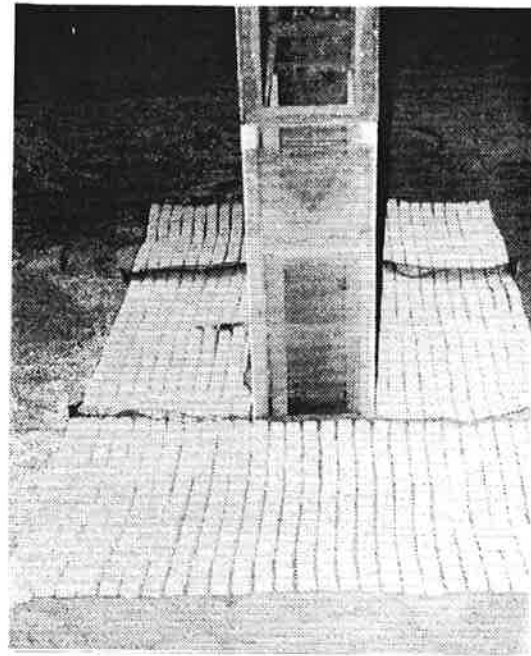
Schematic placement of cable-tied blocks and geotextile around a bridge pier.
